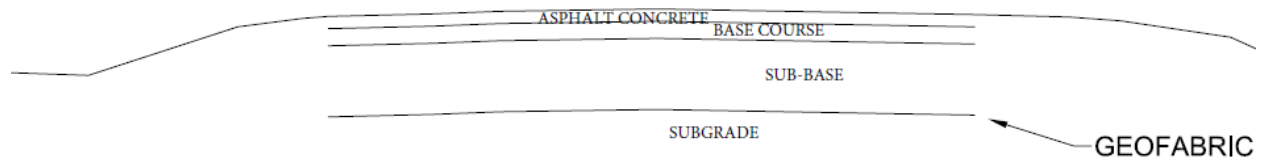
The as-built cross section of the test section FWD3. Horizontal scale is equal to vertical scale.
